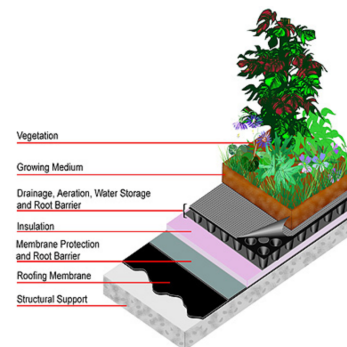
Inverted roof (http://www.lid-stormwater.net/greenroofs_specs.htm)
